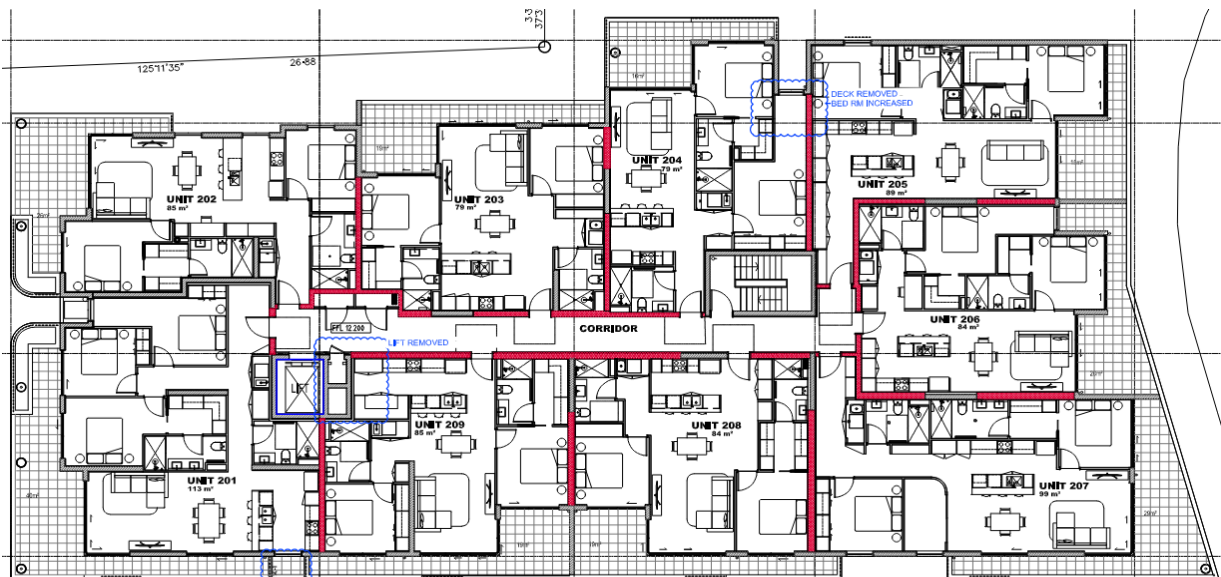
Proposed amended typical floor level 2-4 showing removed second lift and removed balcony of Unit 204
